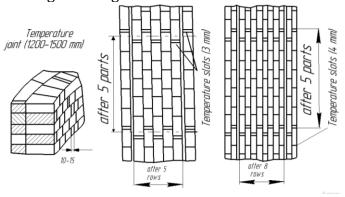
Expansion joints in chipboard masonry a - wall; b and c - hearth.
